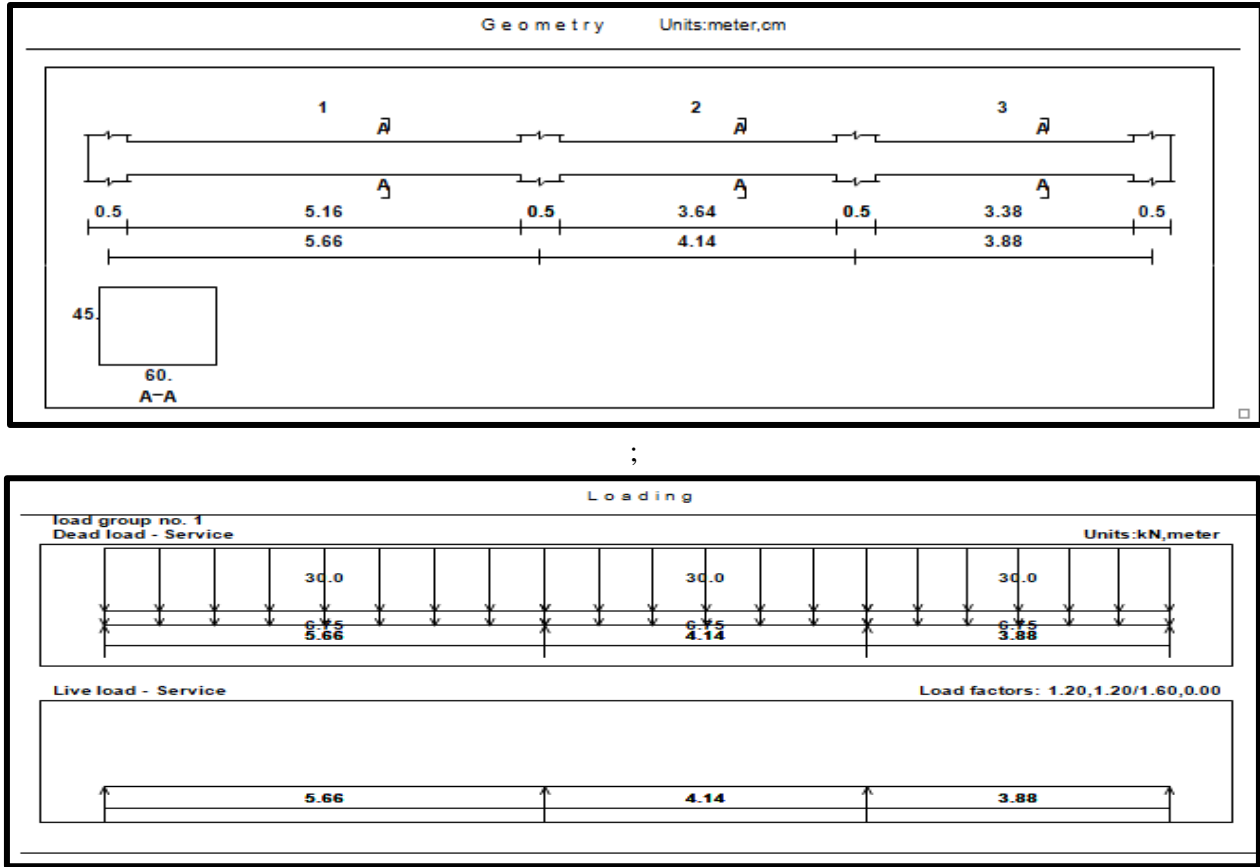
Statically System and Loads Distribution of Beam (GF.B106).
